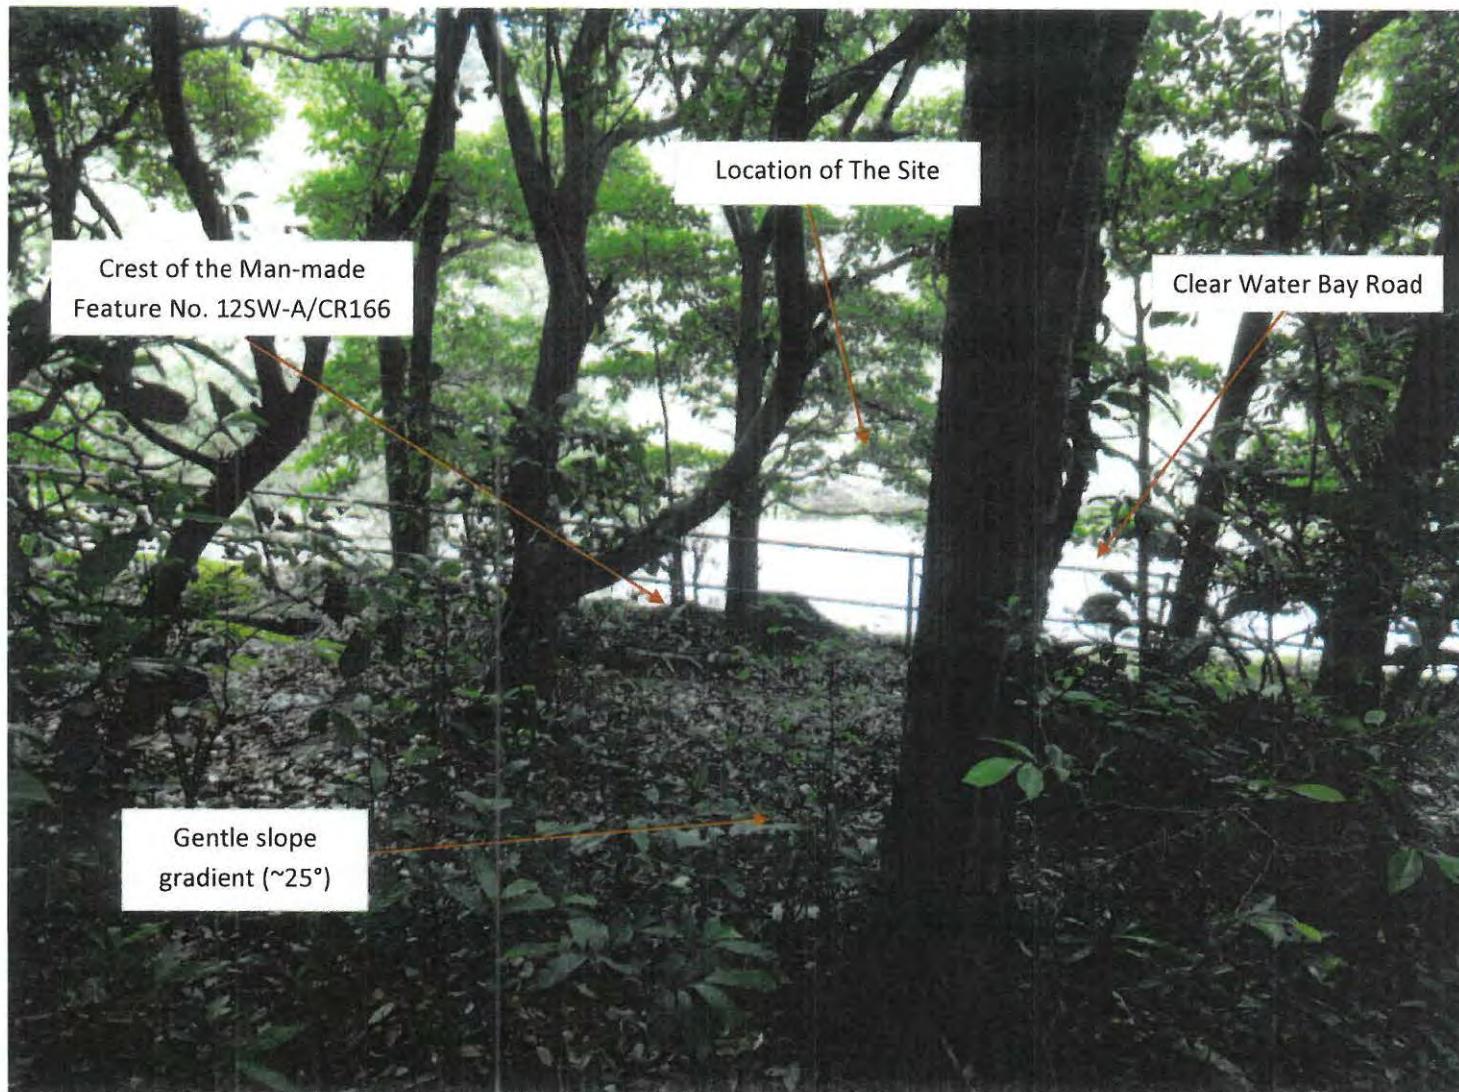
General view of the gentle slope at the lower portion of the Study Area below the existing paved footpath
